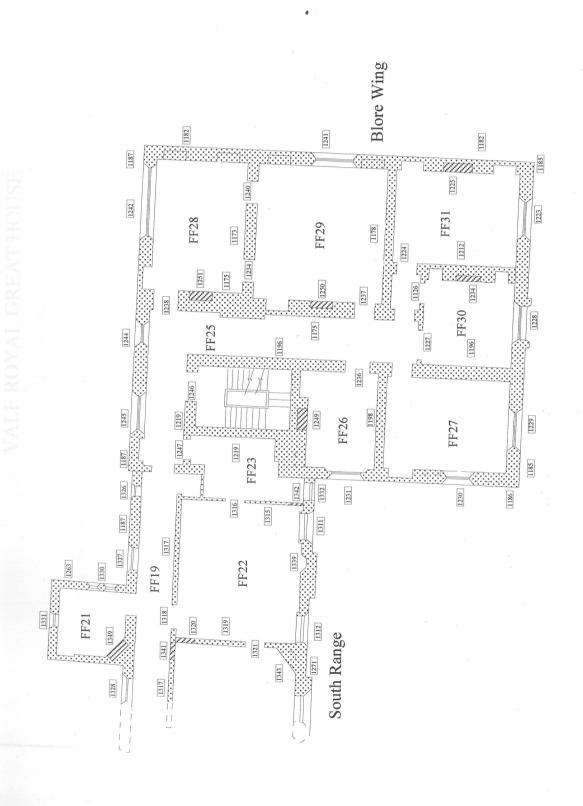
First Floor Plan - East (South Range and Blore Wing)
